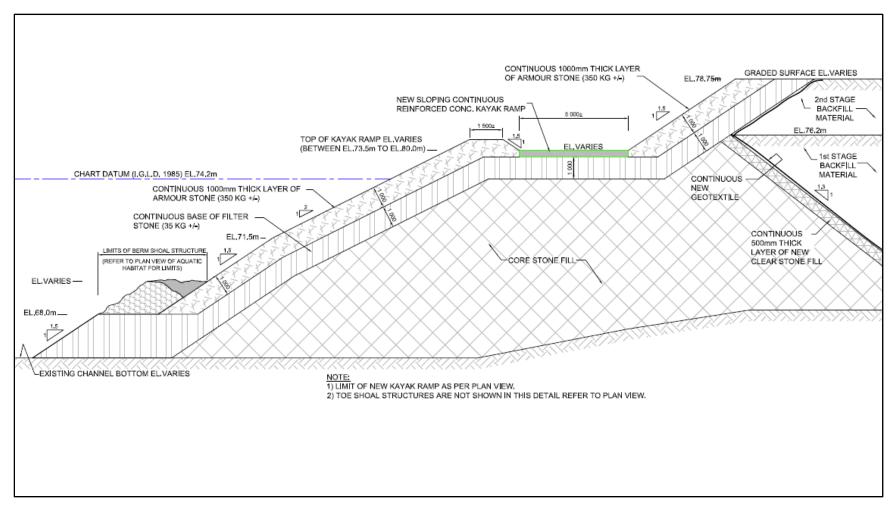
Typical Section at Proposed Kayak Ramp
